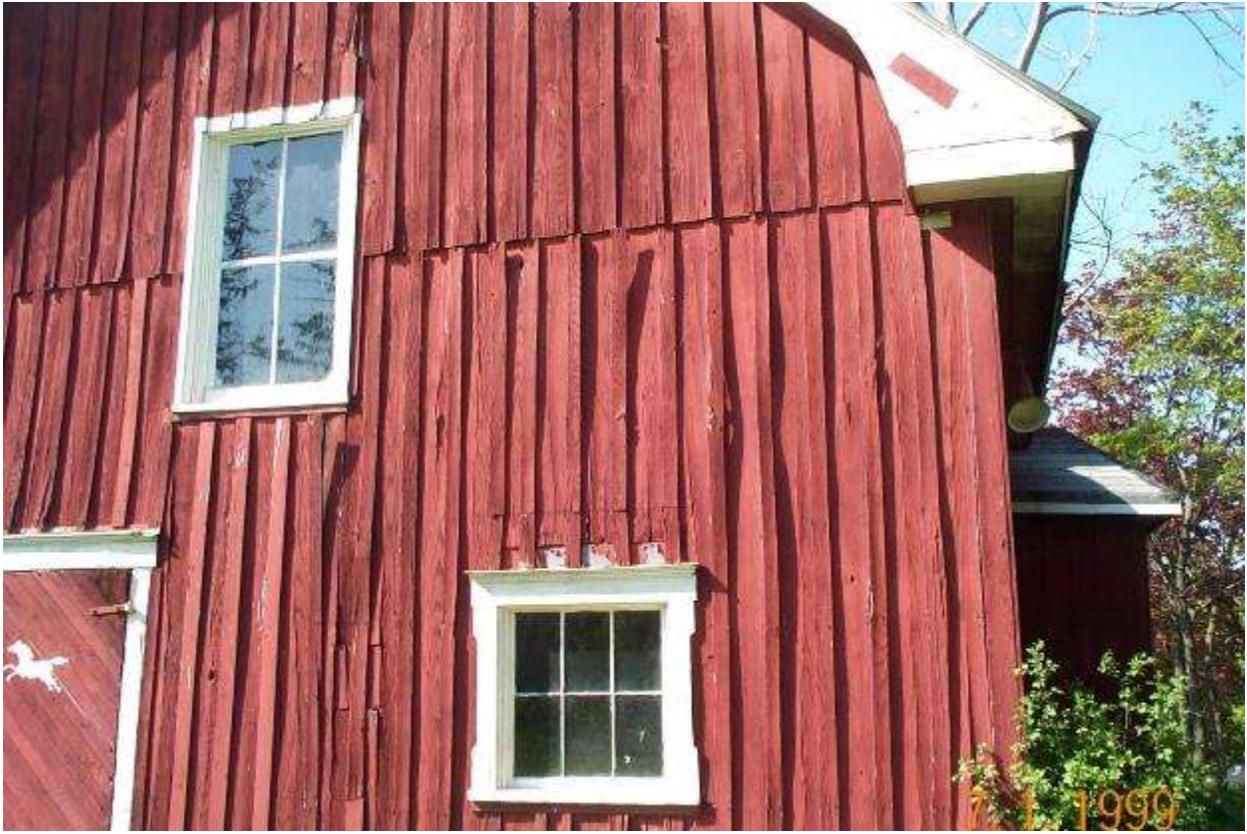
Photograph of the south side of the accessory building, showing board and batten exterior cladding and window details, 1999.
